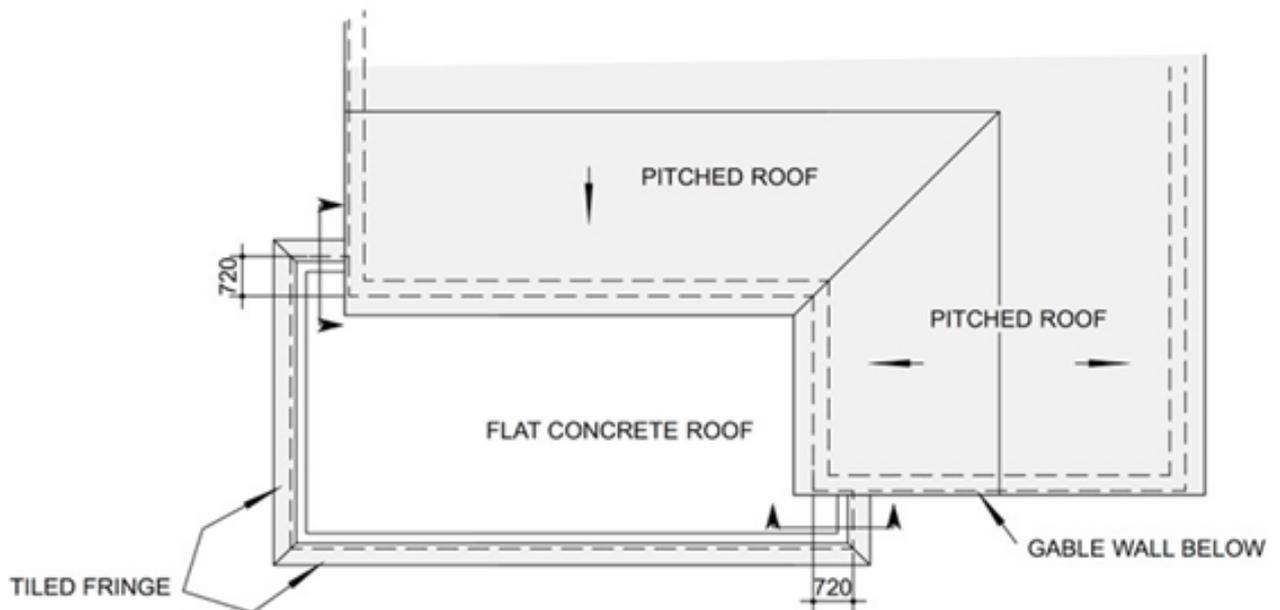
Typical arrangement of a flat roof extension which protrudes beyond an L-shaped pitched roof.
